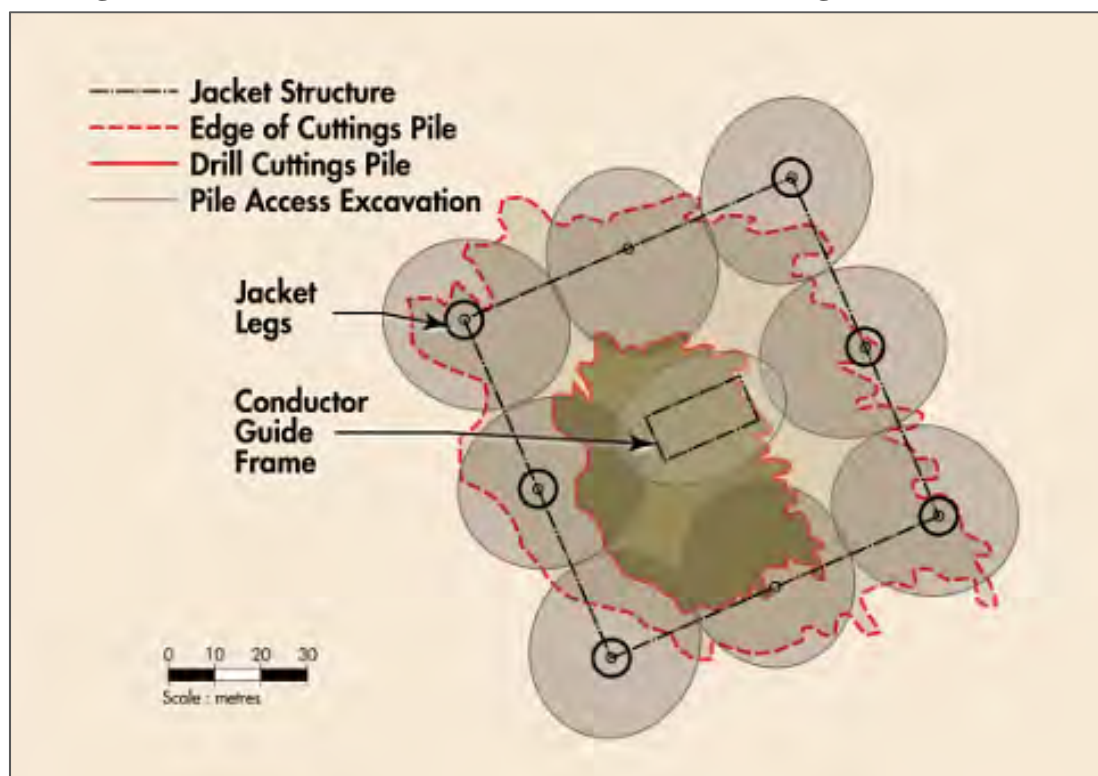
Using a Subsea Dredger to Excavate a Pit
